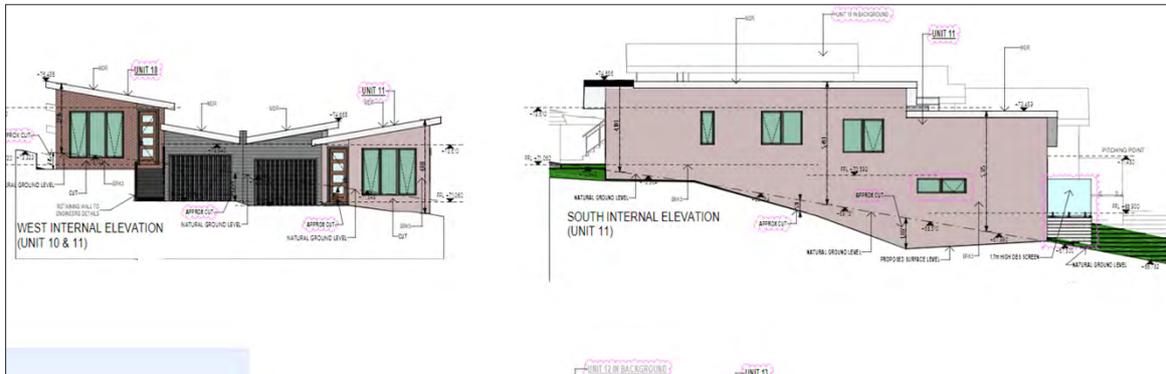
Internal west elevations of unit 10, 11(left) and southern elevation of unit 11
